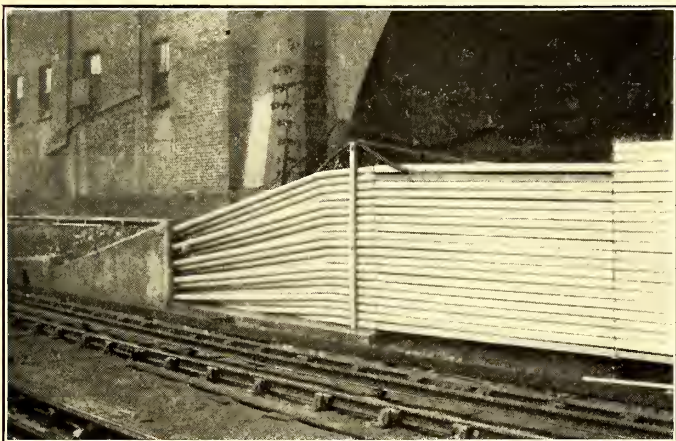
CABLE TROUGHING CONSTRUCTION UNDER HIGH STREET BRIDGE, EAST END
